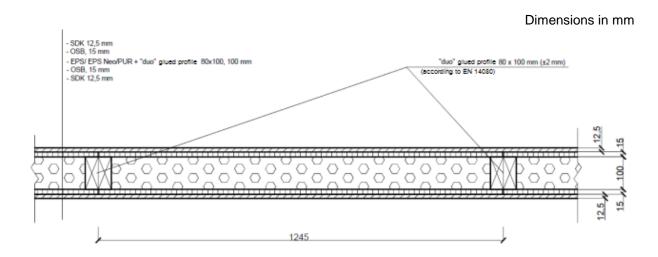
Half size format of the "SE SIP structural insulation panels with OSB skin for floor and roof constructions
